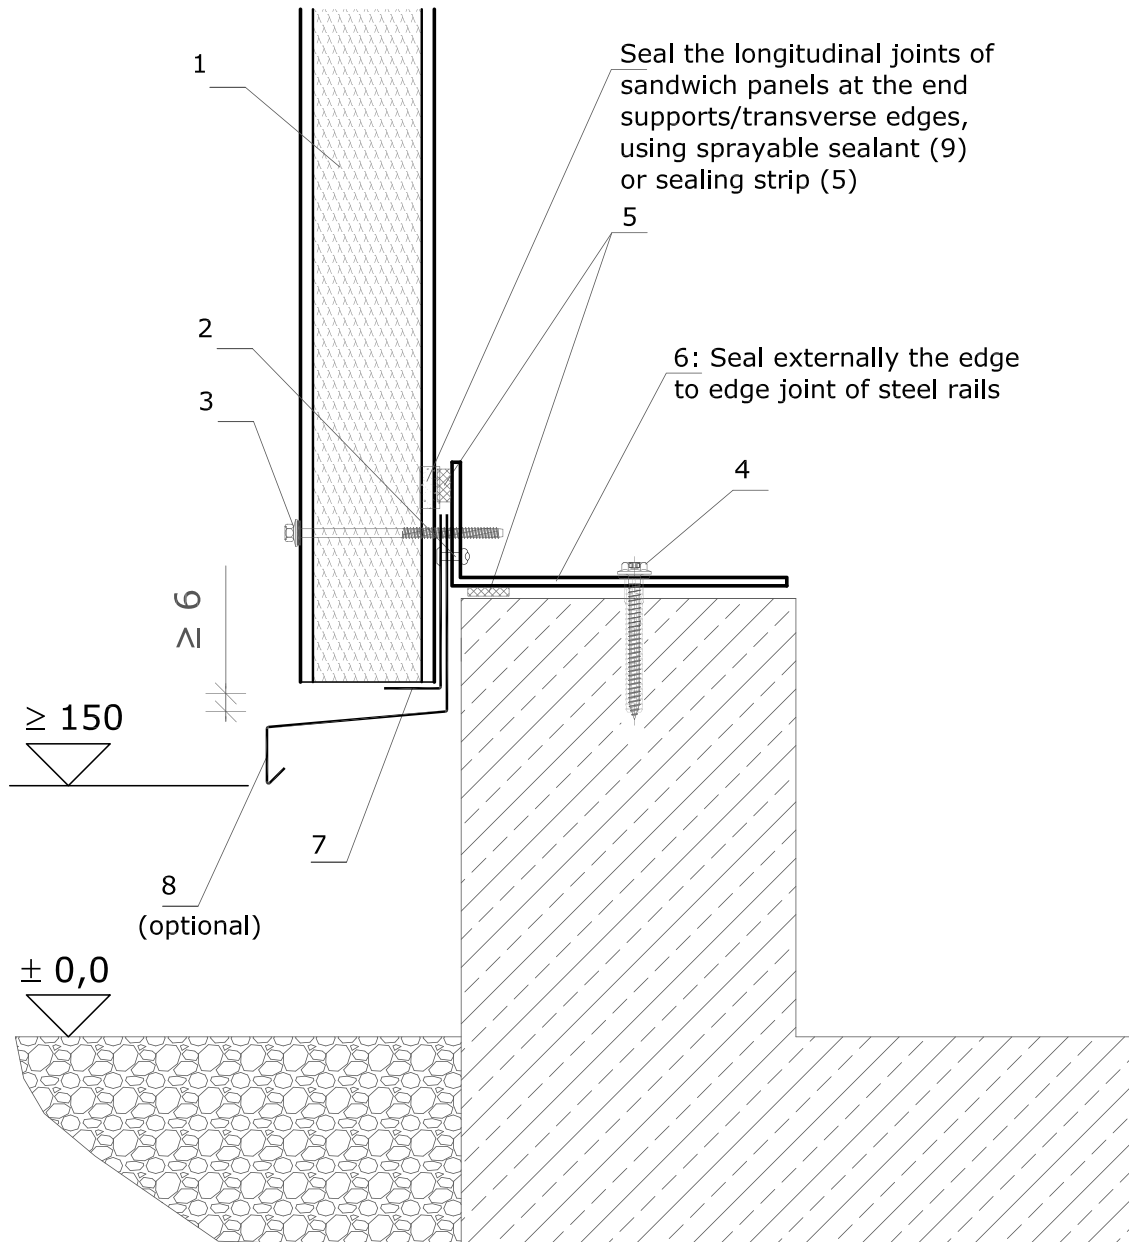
Cladding base Vertically installed panels with hidden fixings on steel support
